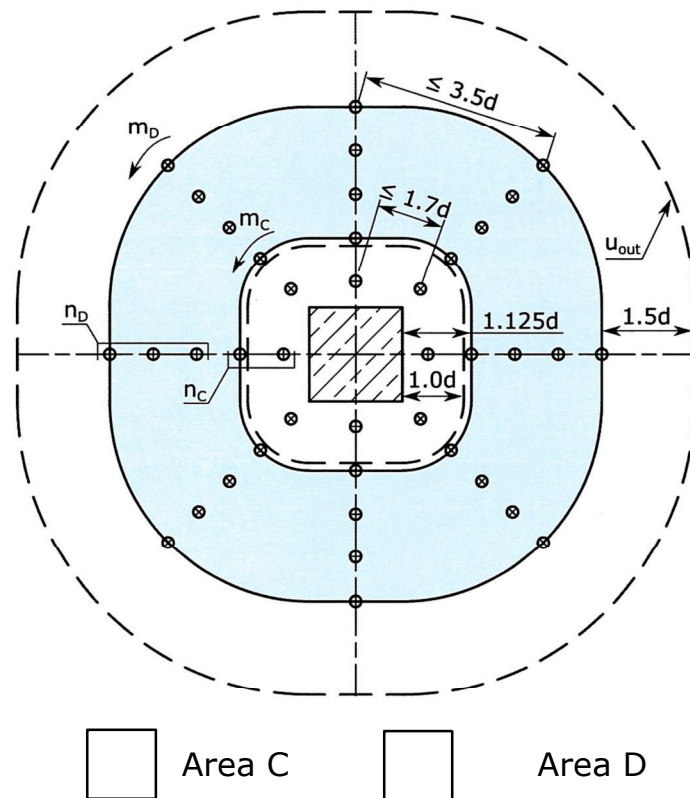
Marking the areas and positioning of the FBD studs in the reinforced concrete floor slab
